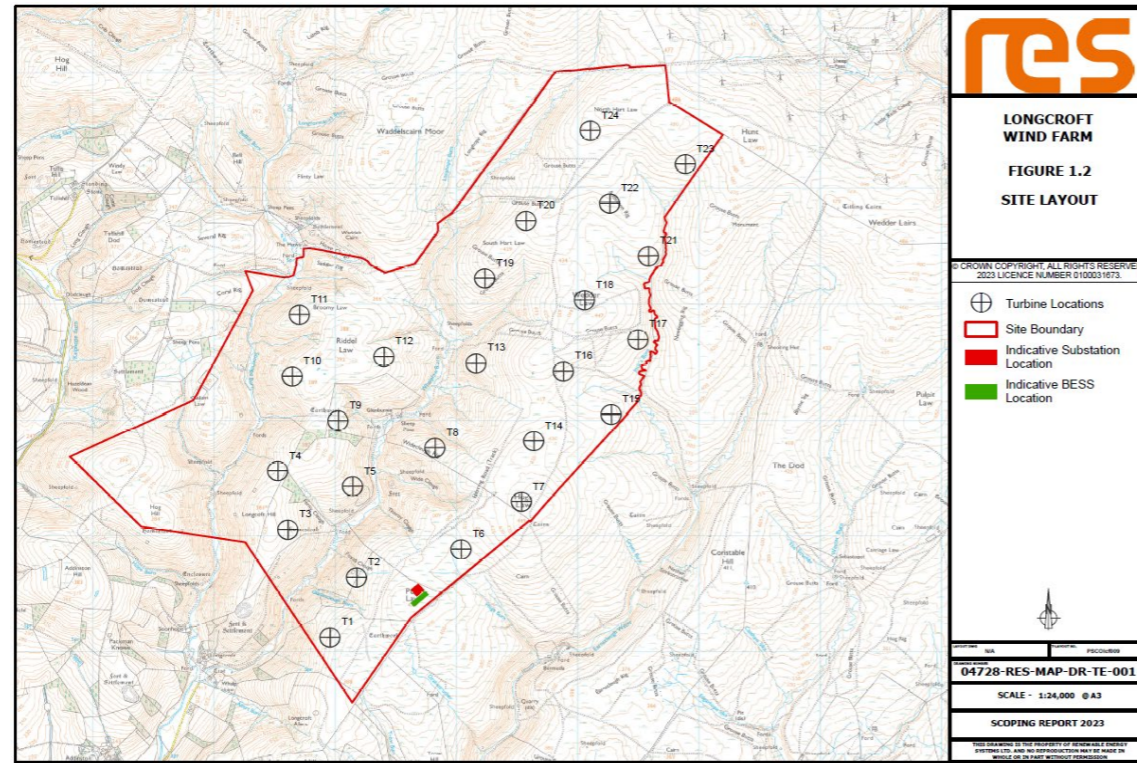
Preliminary Site Layout (see Figure 1.2 for full scale plan)
